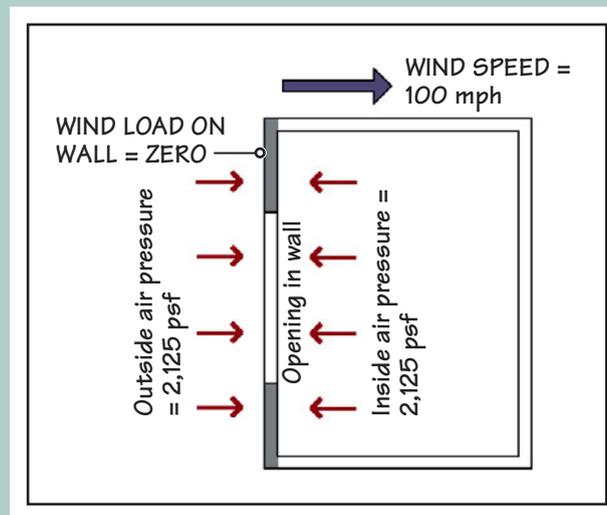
Outside and inside air pressures in an enclosure that has a large opening on the windward wall.
